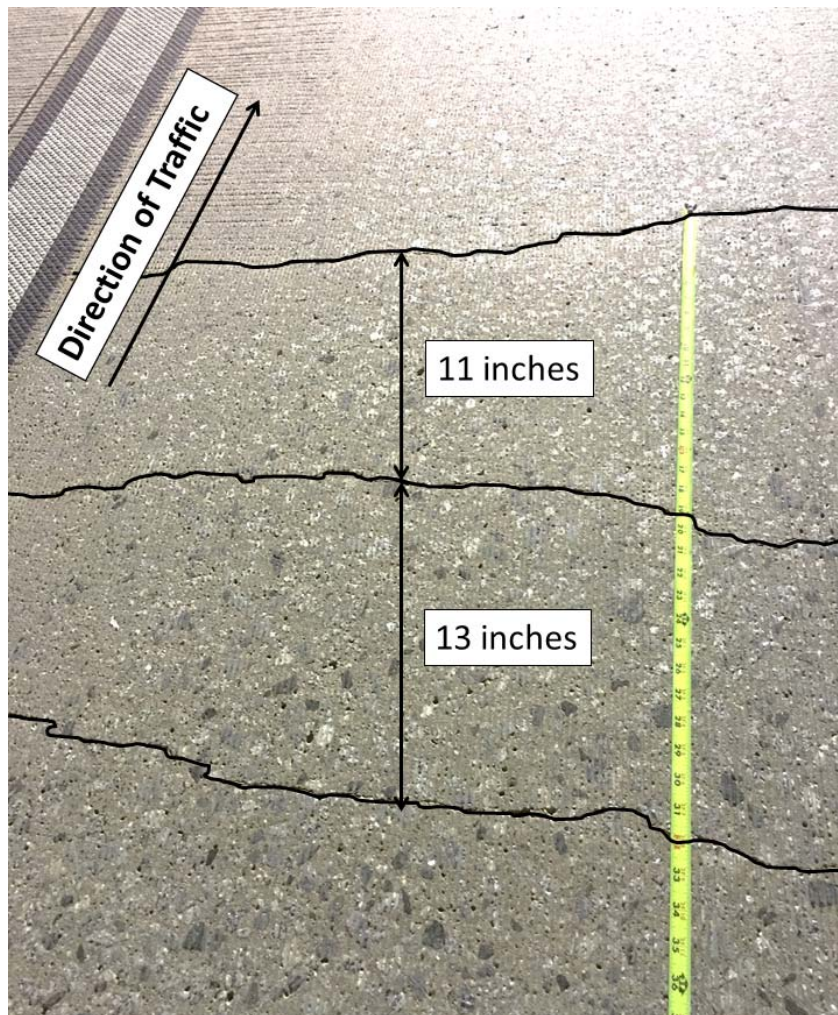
I-85 Typical Transverse Crack Pattern (Cluster Cracking)
